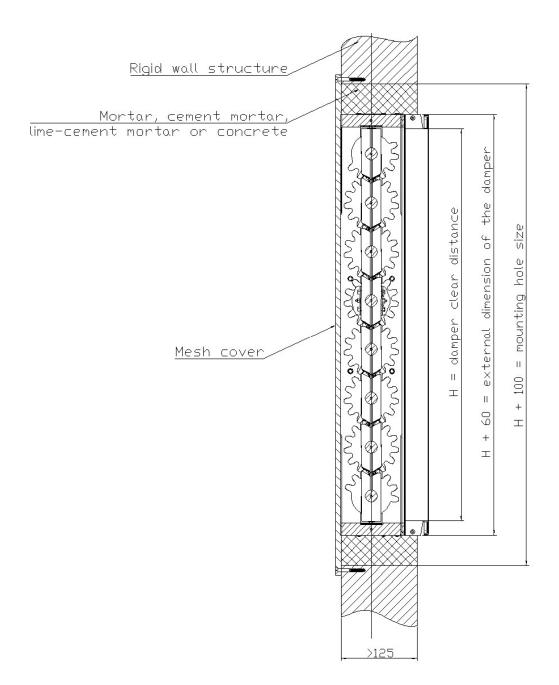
Installation method of fire dampers WKP-O in structures thicker than 125 mm
